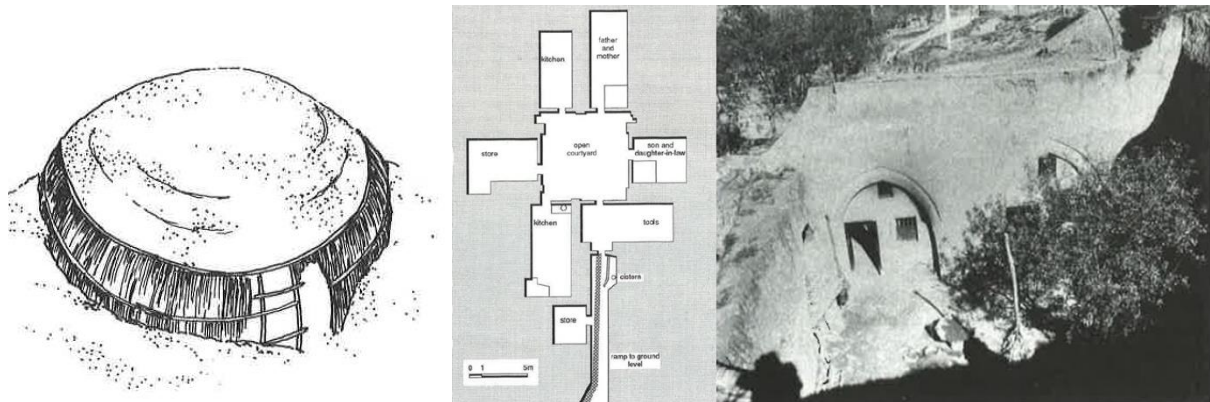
Left: Pima Ki, subterranean construction. Middle: Diagrammatic plan of an extended cave dwelling in the Yuxi region, China. Right: Cave dwellings cut from Loess, north China.²⁷
